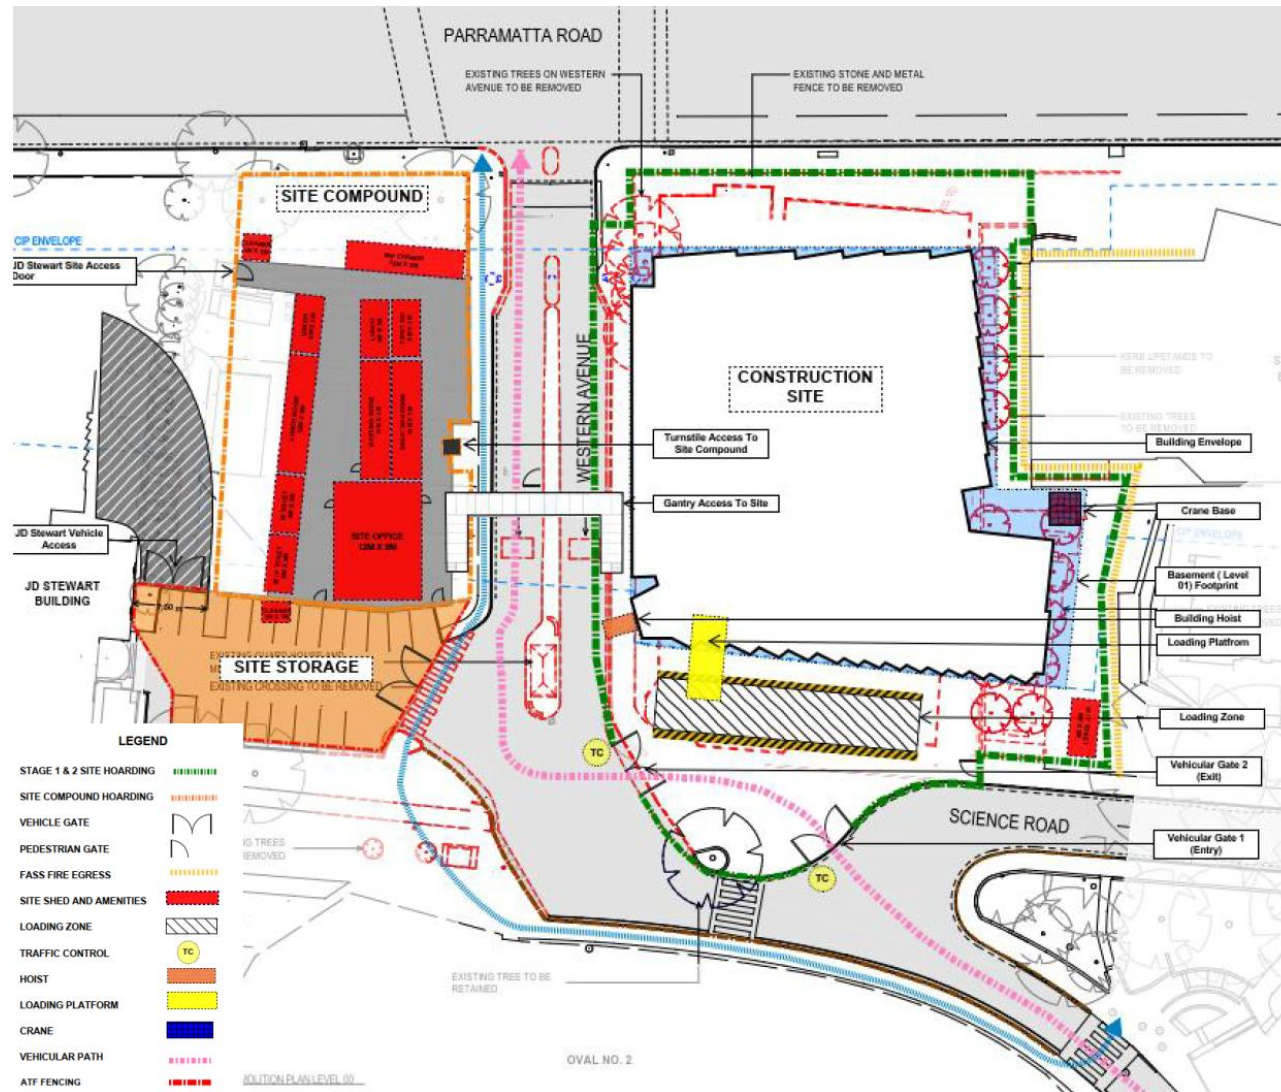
Site Plan of Proposed Stage 1 Works (Source: CTPMSP, SCT Consulting)
